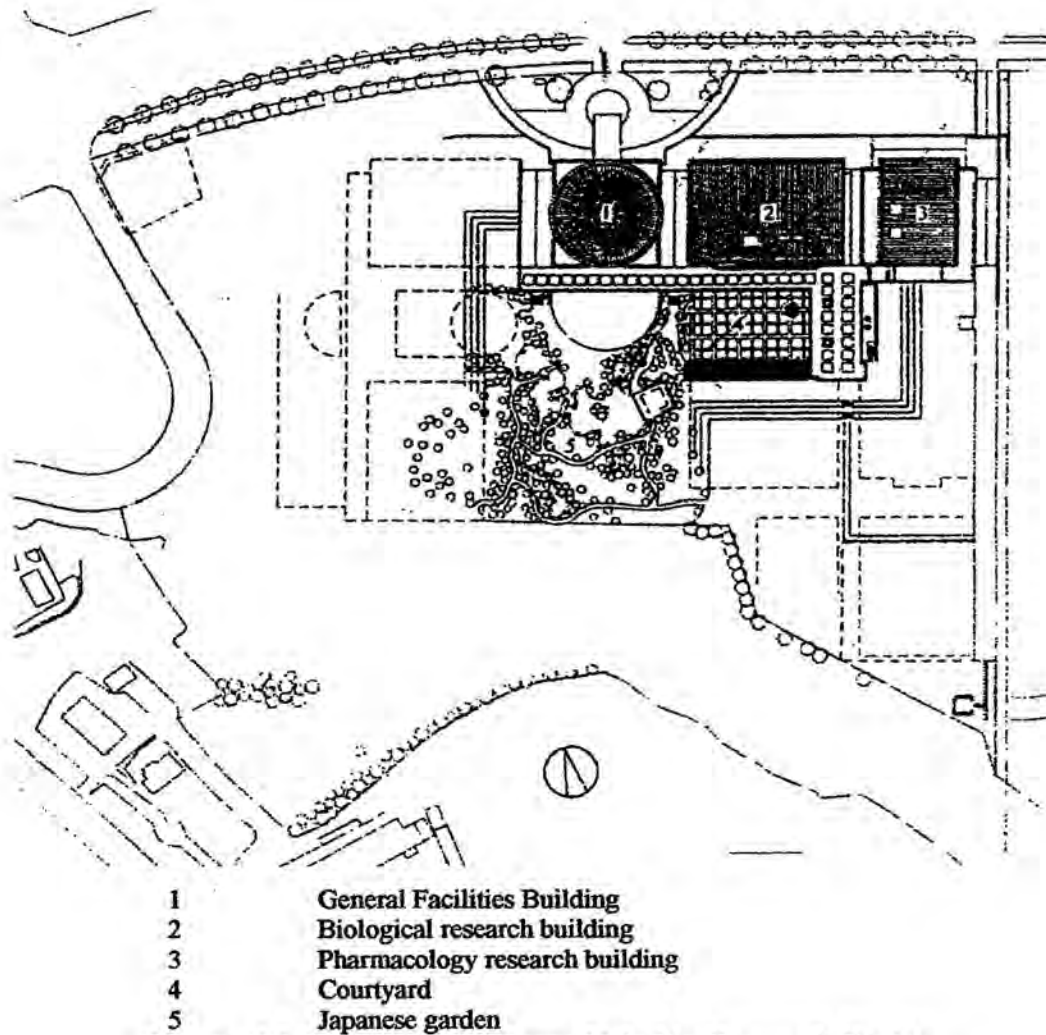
Site plan of Bayer Yakuhin Research Centre
